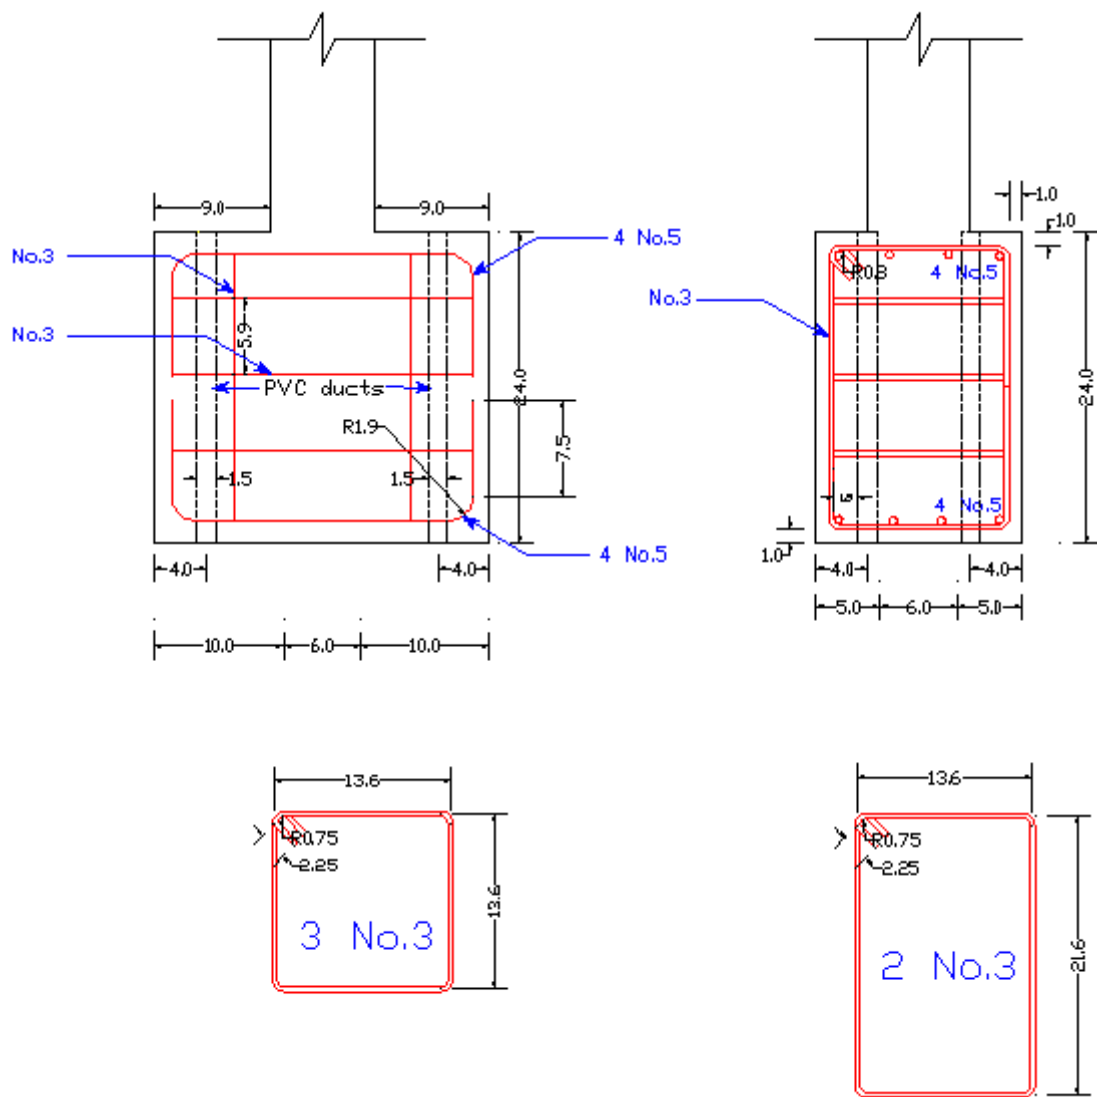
Schematic drawing of the footings of specimen F-RC
